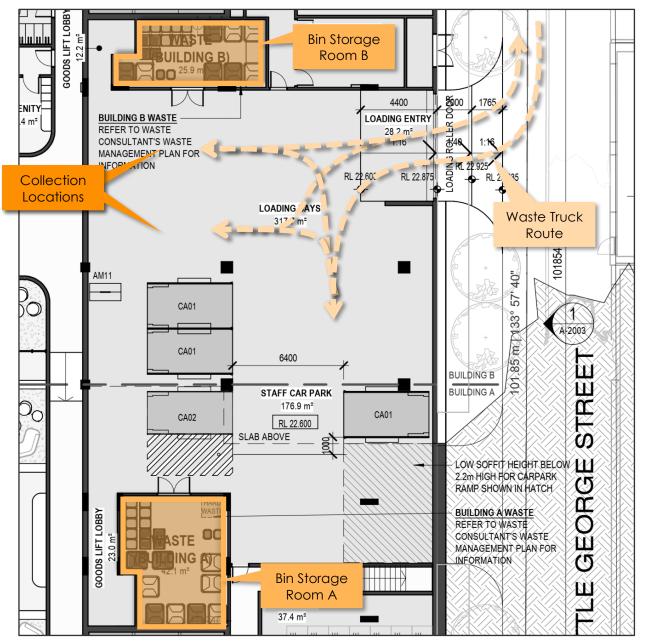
Bin Storage Rooms and Collection Details (Lower Ground 1 Level)
